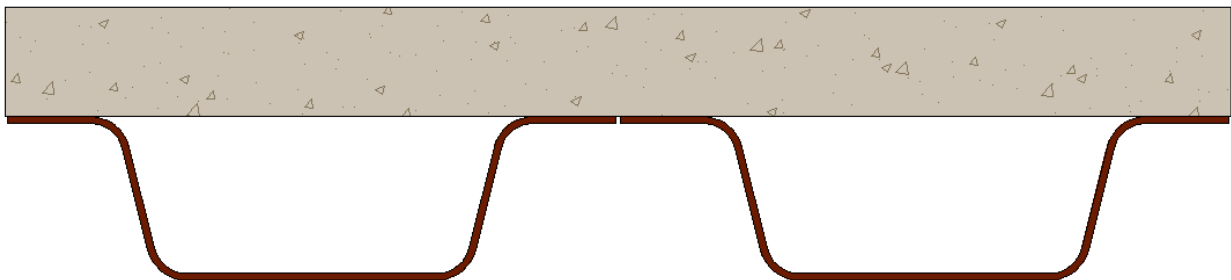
Conceptual View of Proposed Double-Girder Modular Layout
